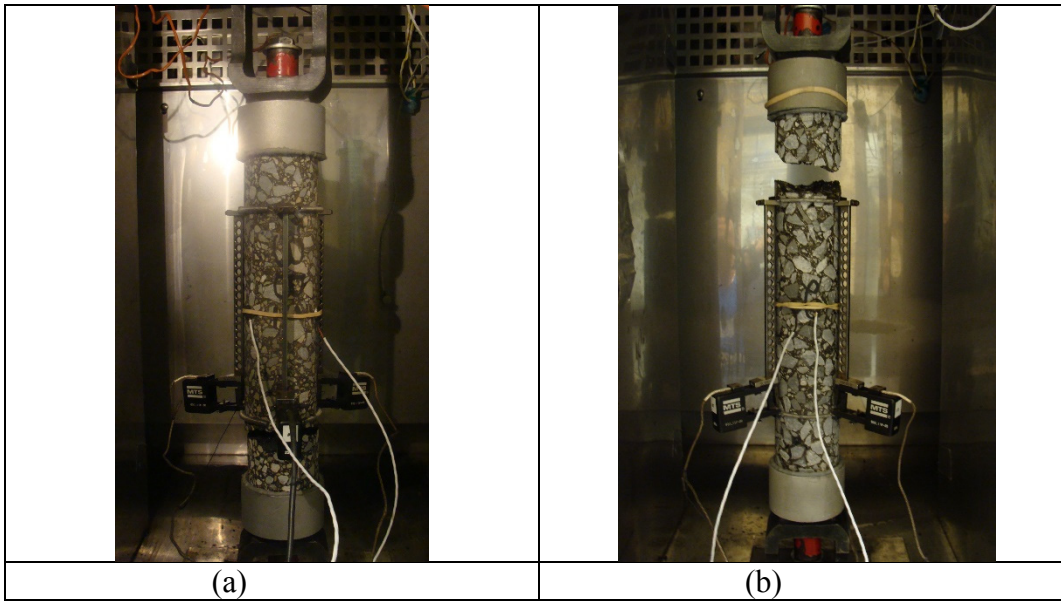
TSRST test installation: (a) before the test, (b) broken specimen after the test
